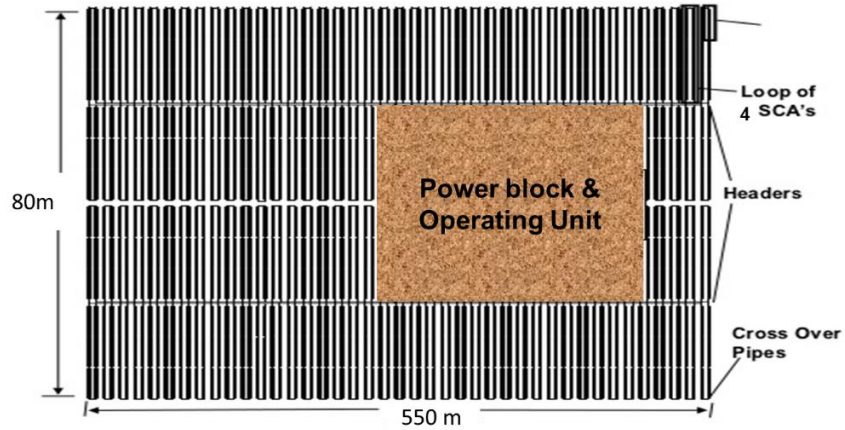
Land Area Layout of Parabolic Trough Plant
